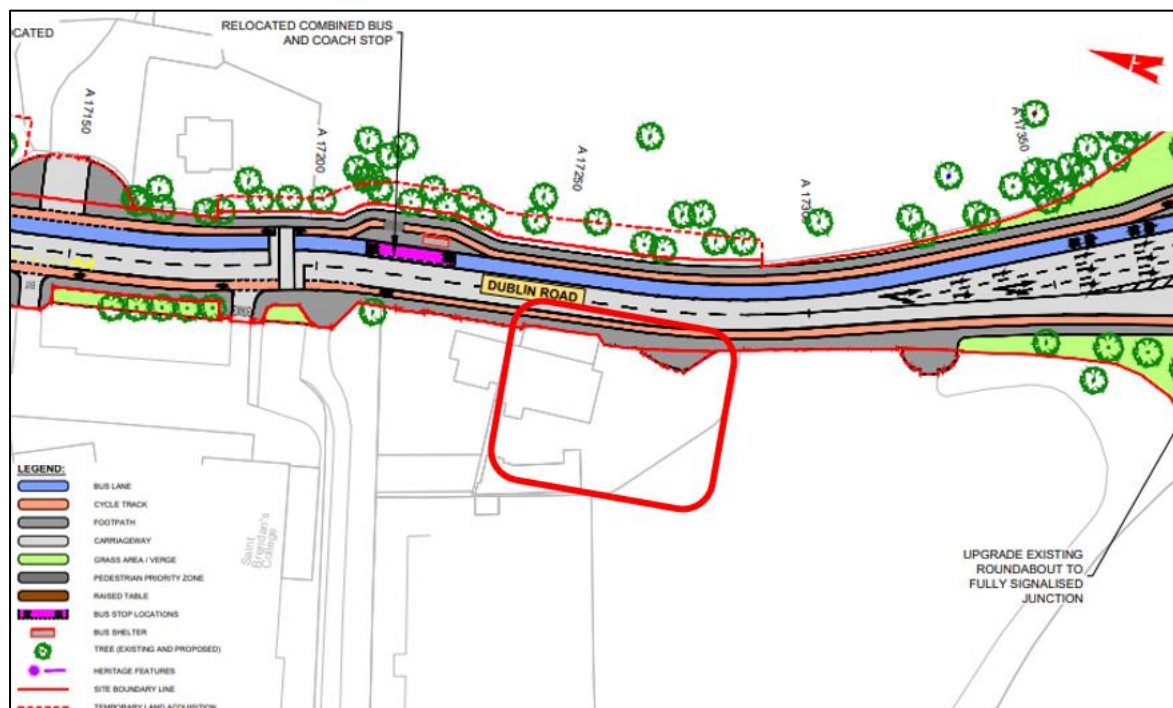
Extract from General Arrangement Drawing at Dublin Road (Sheet 49)
